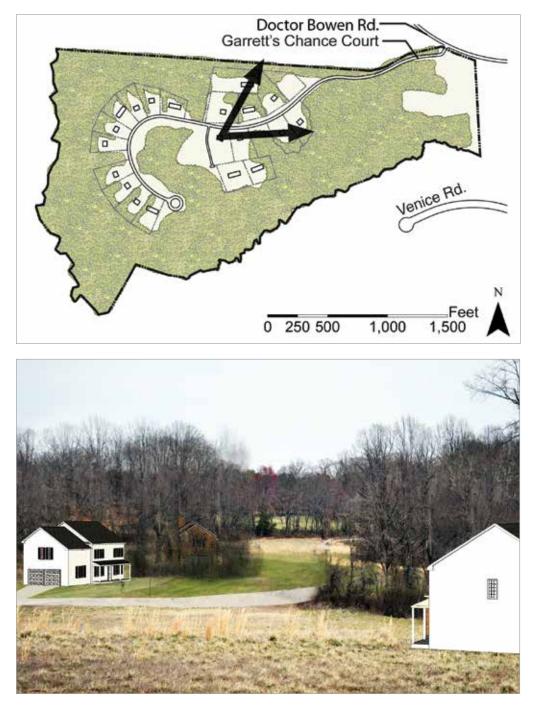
and 27. Conventional subdivision buildout; looking northeast at what buildout under conventional design could look like with residential design guidelines in place
